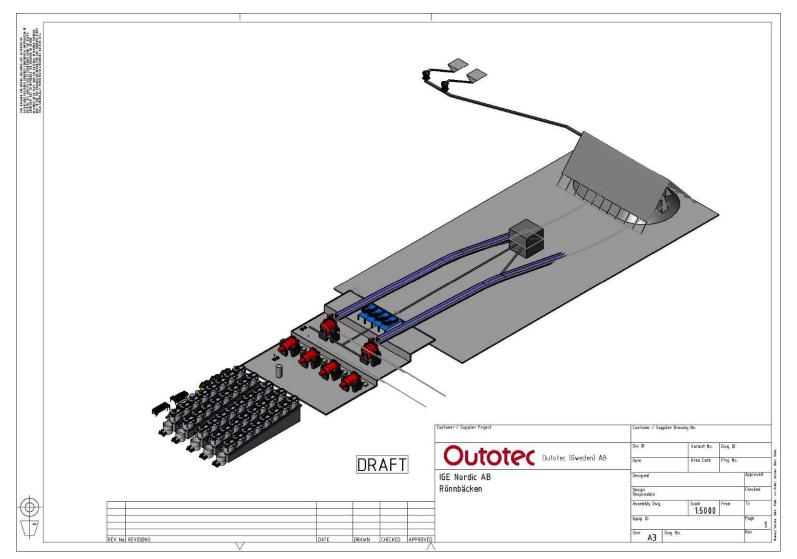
Process Plant Layout, Oblique View (Outotec Sweden AB)
